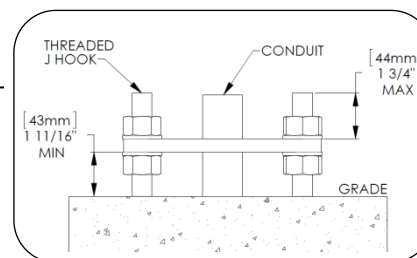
Anchor install detail, 4.2m, 5.0m or 5.8m pole
